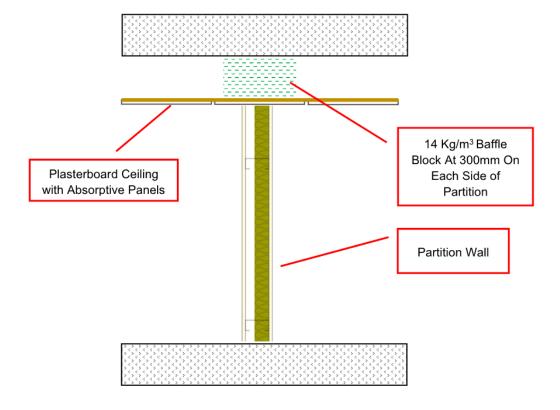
Solid Wall Detail – for wall with less than Rw 30
